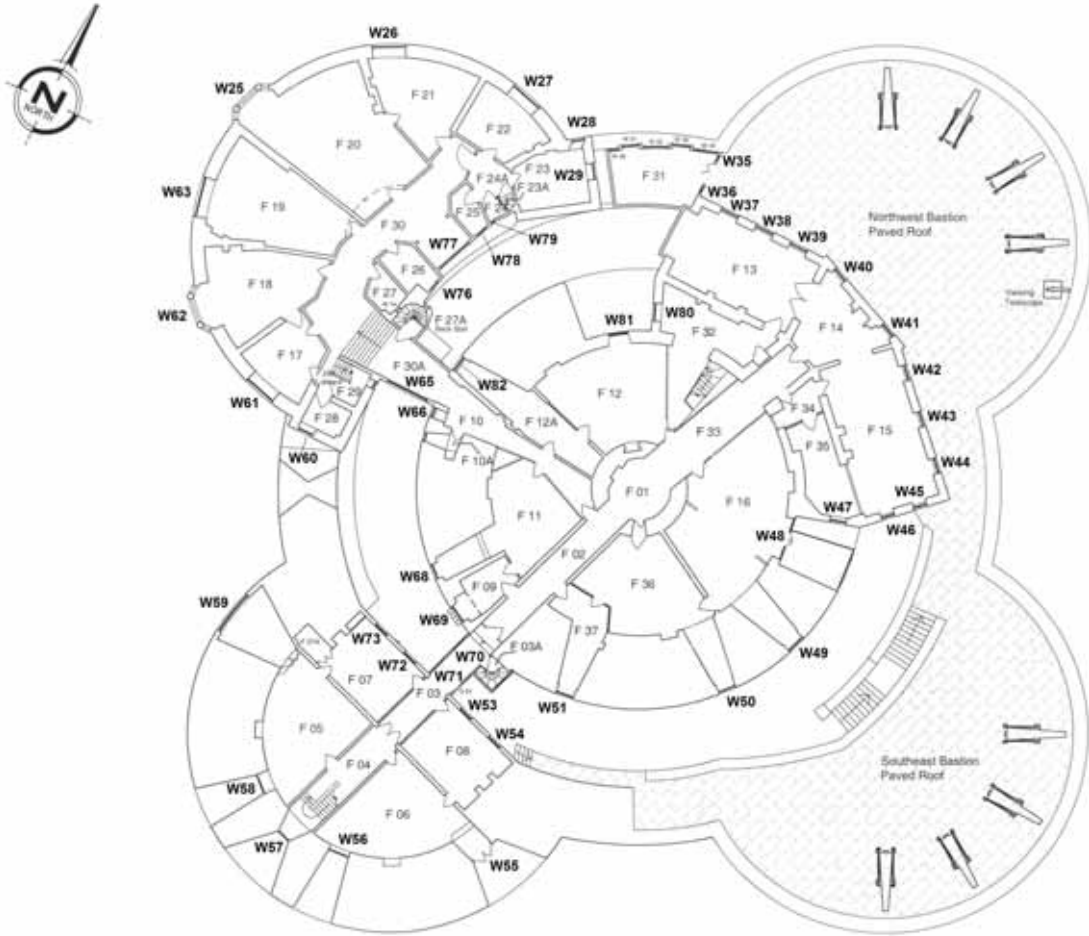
First floor plan of Walmer Castle (© Broadway Malyan)
